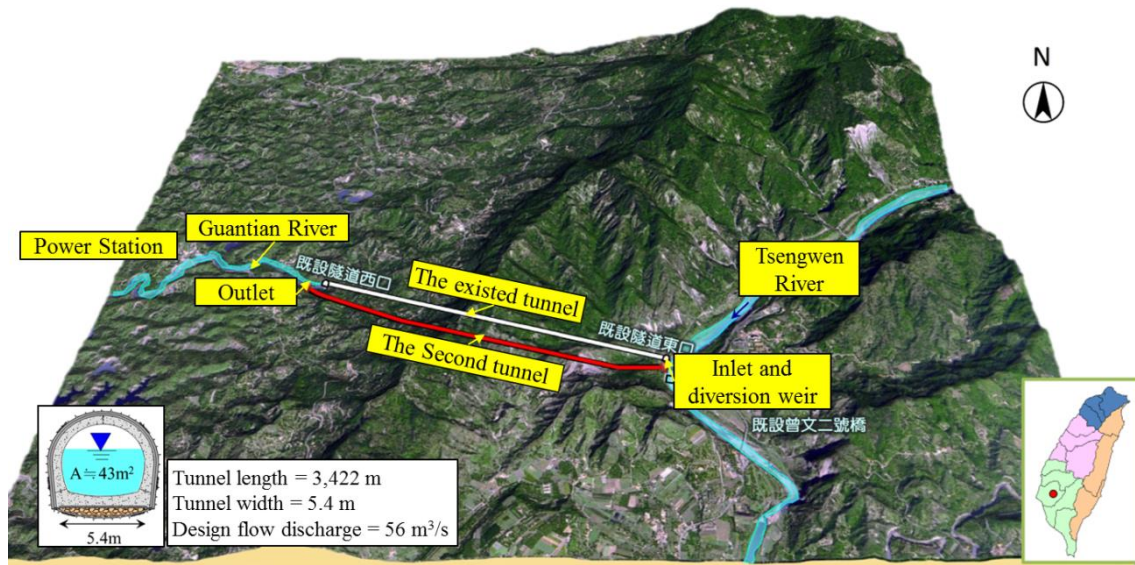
The engineering layout of Wu-Shan-Ling Tunnel located in Southwestern Taiwan.
